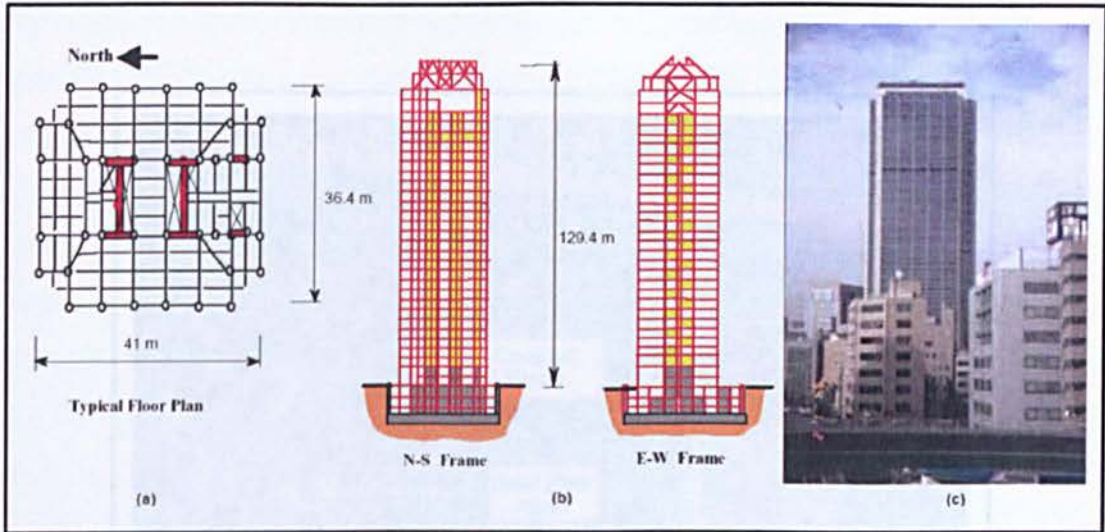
(a) Floor plan (b) elevation section (c) Photo of 35-storey Kobe building (Photo courtesy of C.E. Ventura)
